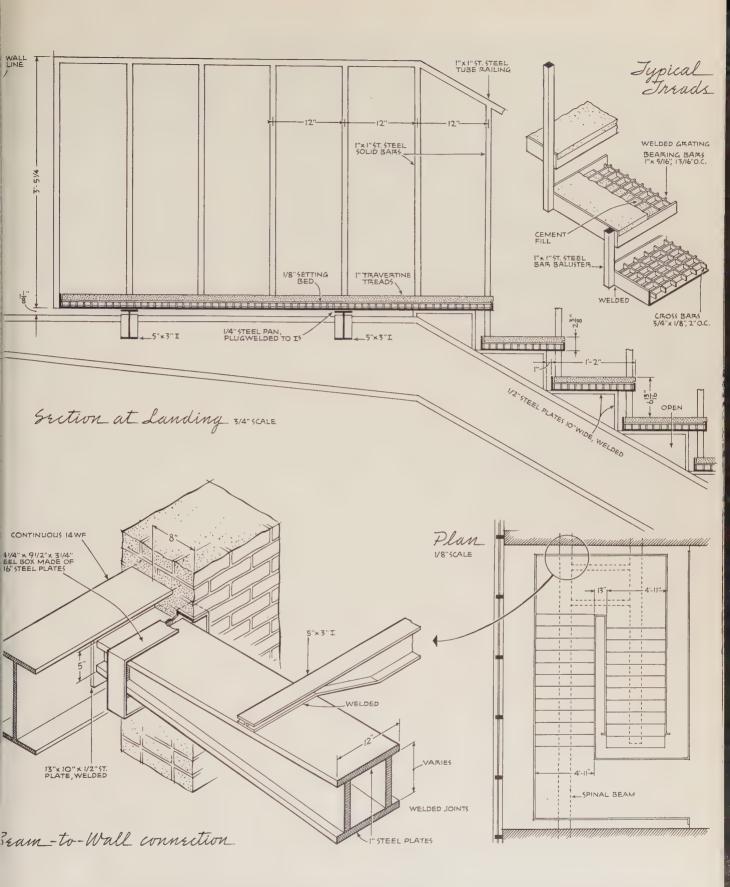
Spinal-beam stair details are shown in this architectural drawing. For the beam-to-wall connection the flanged steel pan was sized to fit the brick coursing dimensions. Buried in the brick wall is a horizontal structural
